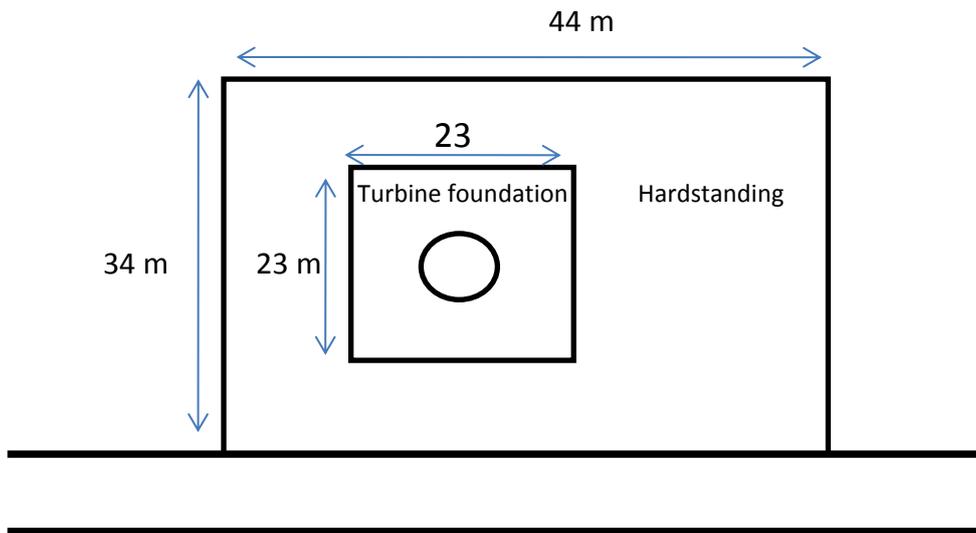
Schematic of the dimensions of a typical turbine base excavation
